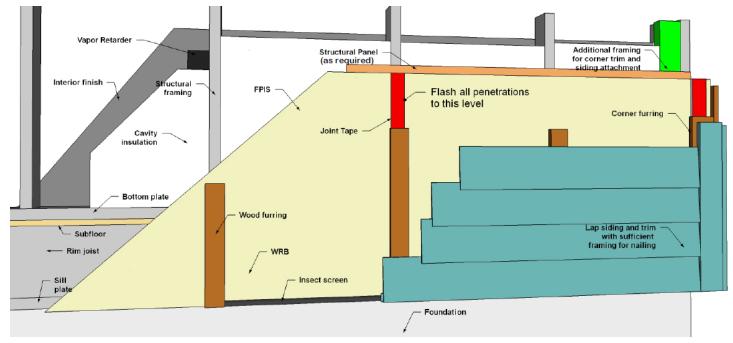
Wood-Frame Wall with Structural Panel (as required) Bracing and Exterior Finish of FPIS (joints taped) as WRB, Furring, and Lap Siding<sup>xvii</sup>
